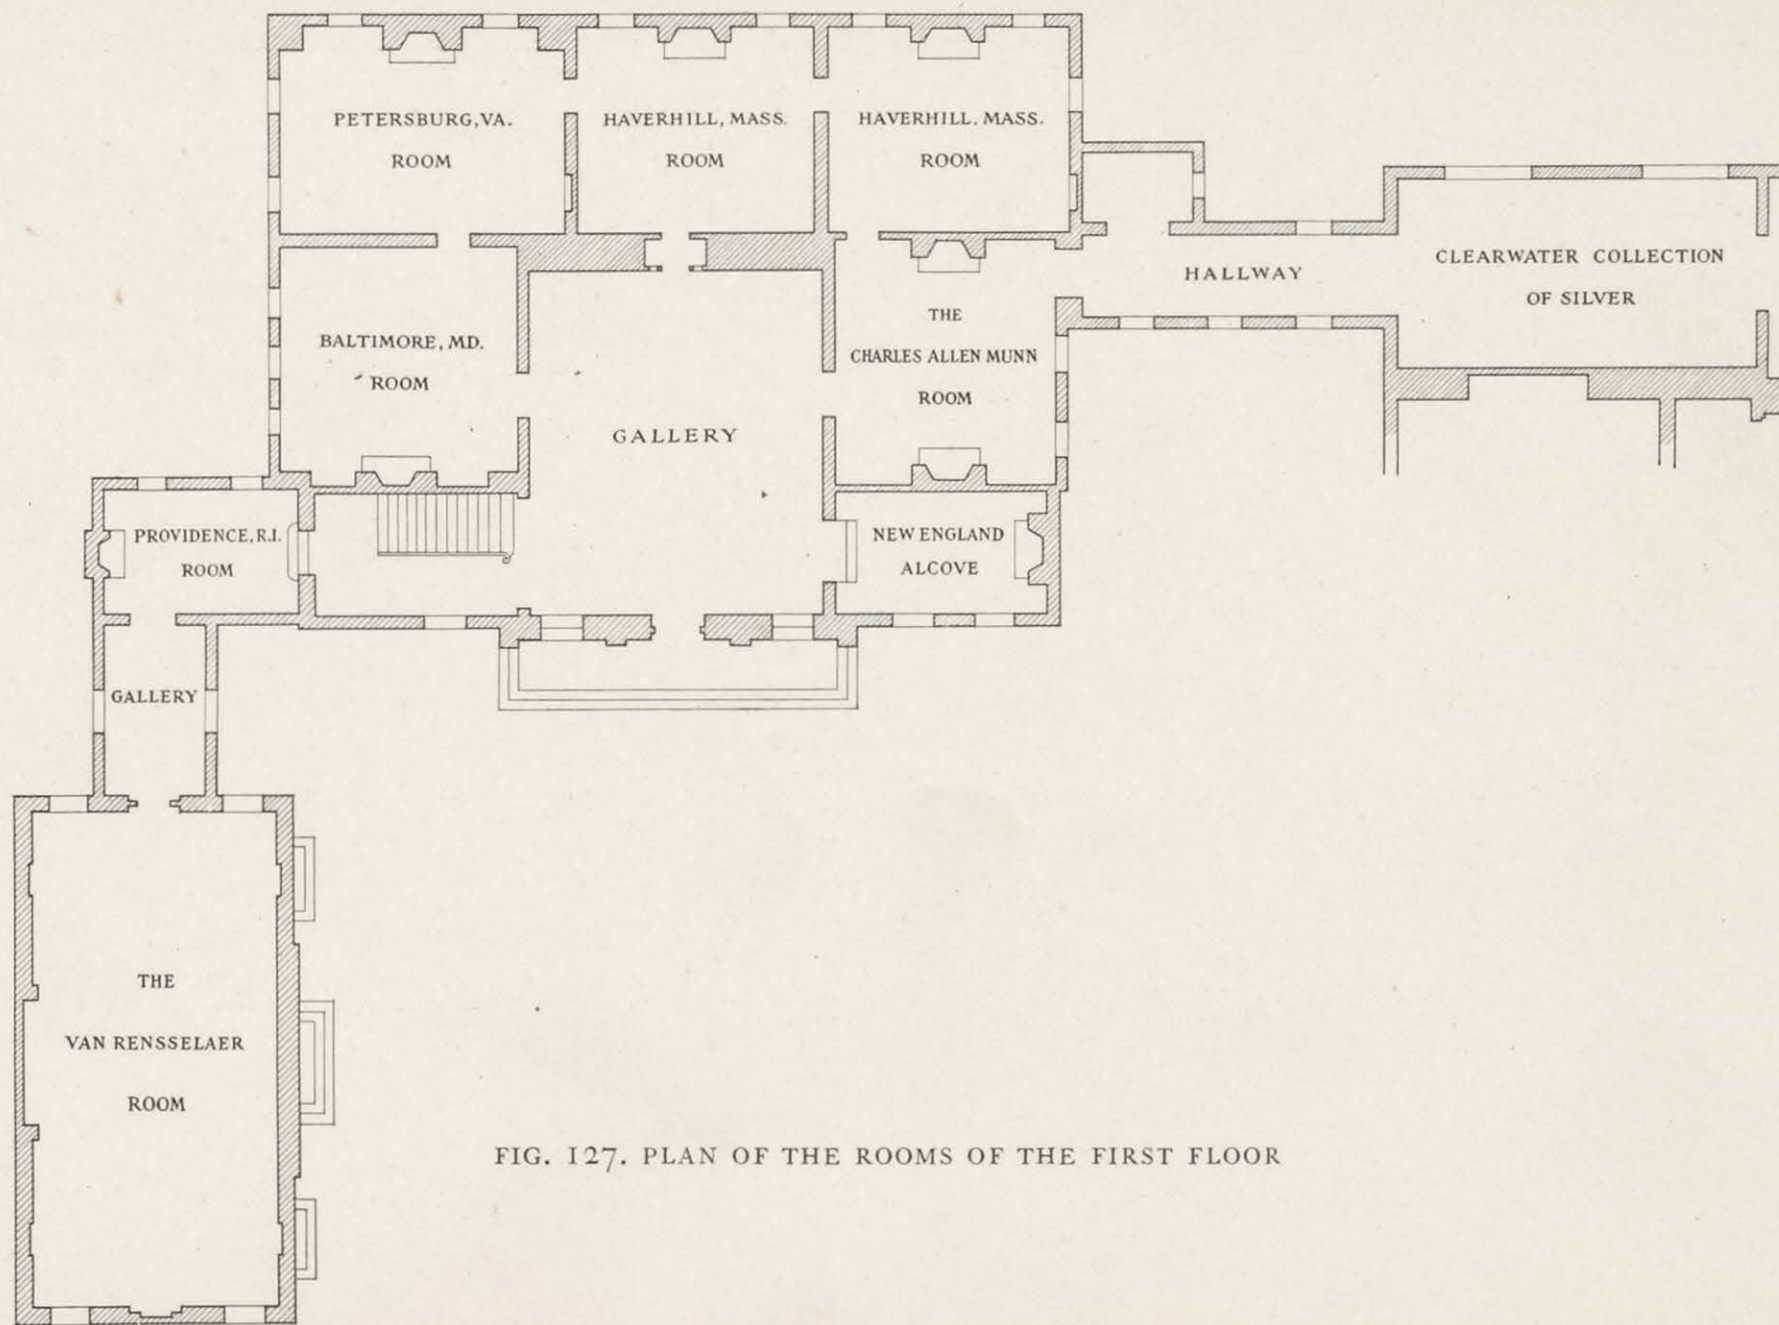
PLAN OF THE ROOMS OF THE FIRST FLOOR
